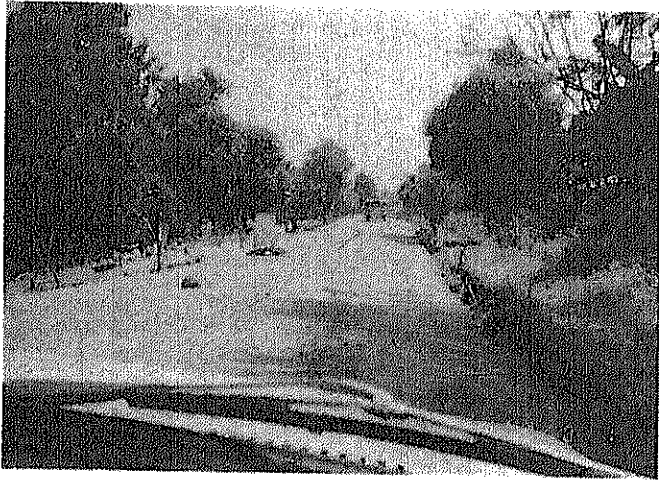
Damage to the low bank section of Longas Junction ; swelling of surface
